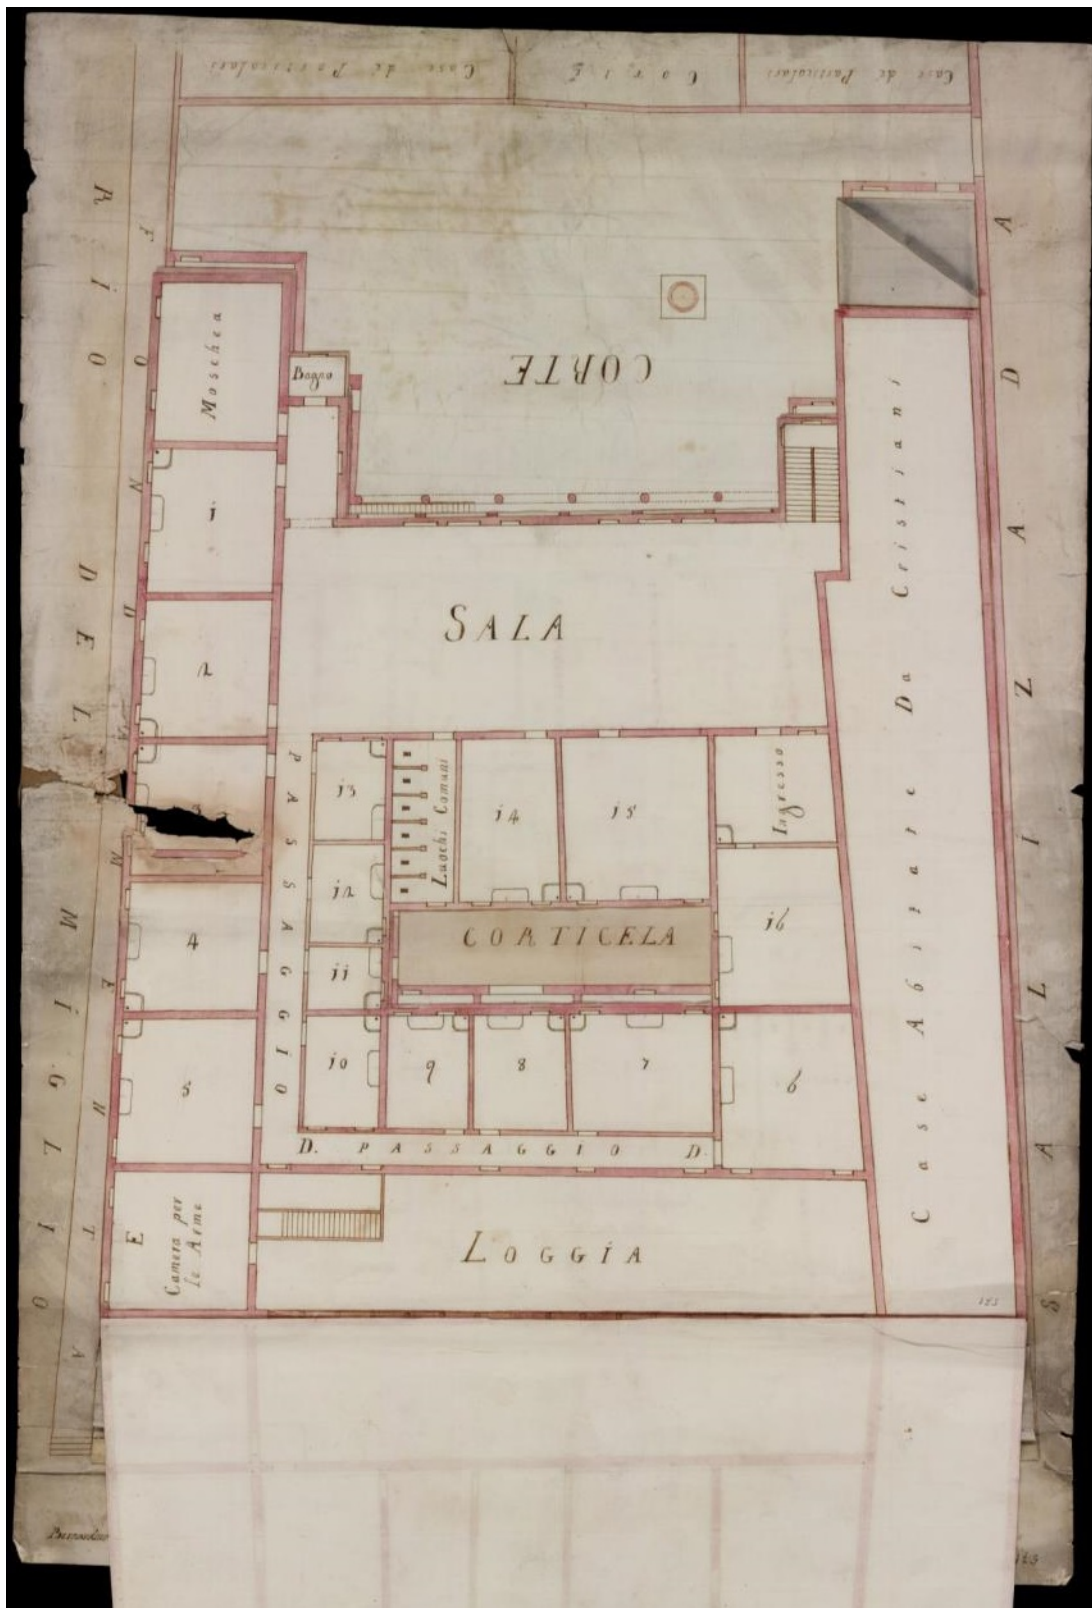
21 Bernardino Maccaruzzi, *Fondaco dei Turchi* – first-floor plan, 1768.
